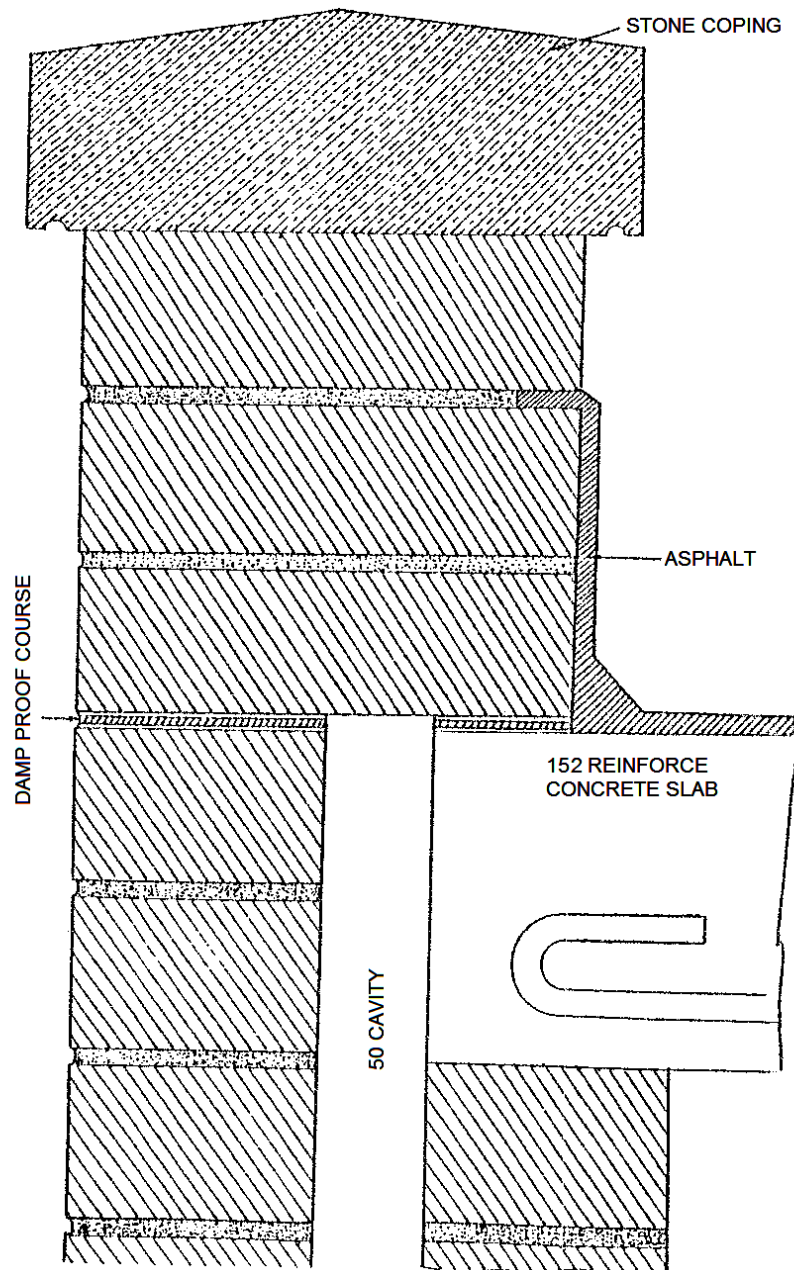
Section through 280 mm cavity wall showing treatment through flat roof
